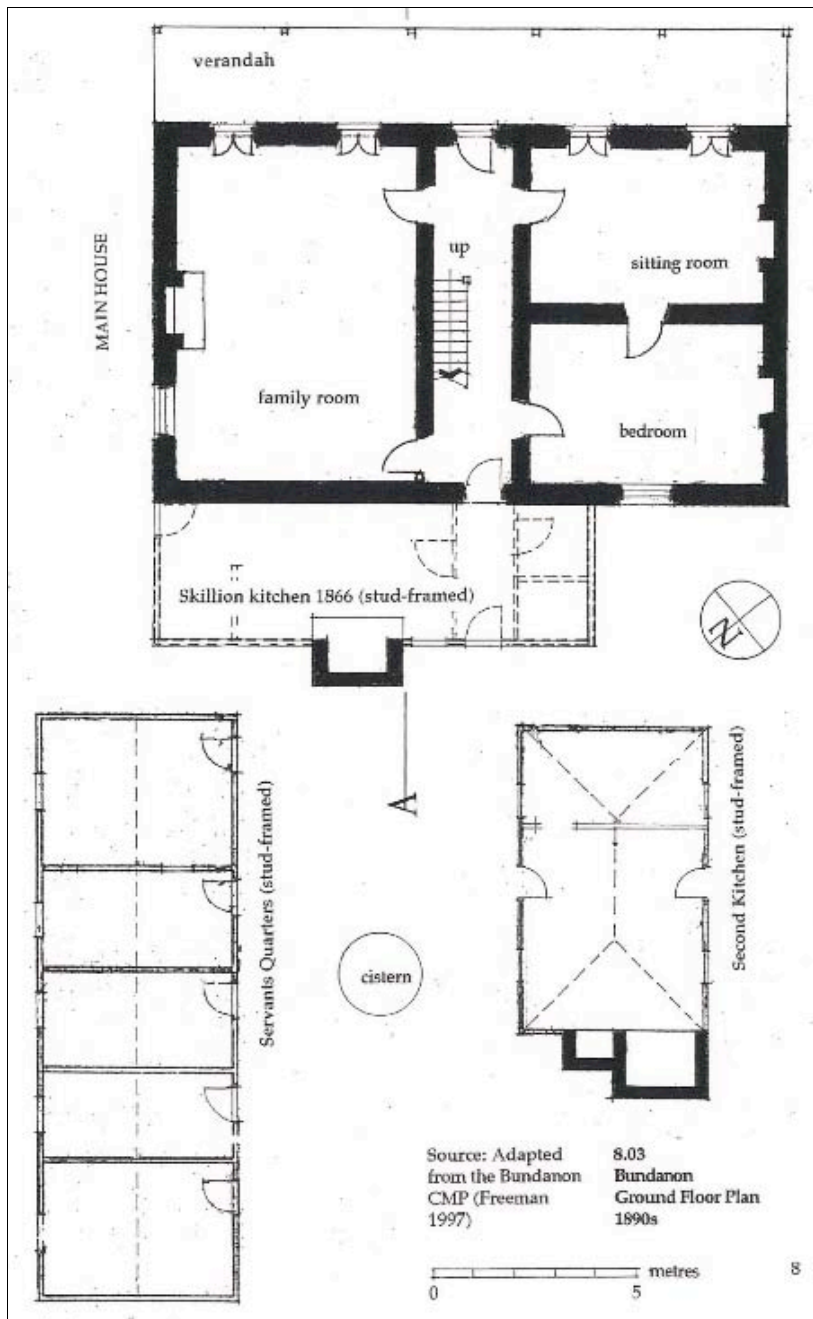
APPENDIX 1 • Bundanon ground floor plan c1900 • Source: SHSC and PF/PL in Hobbs op cit.
